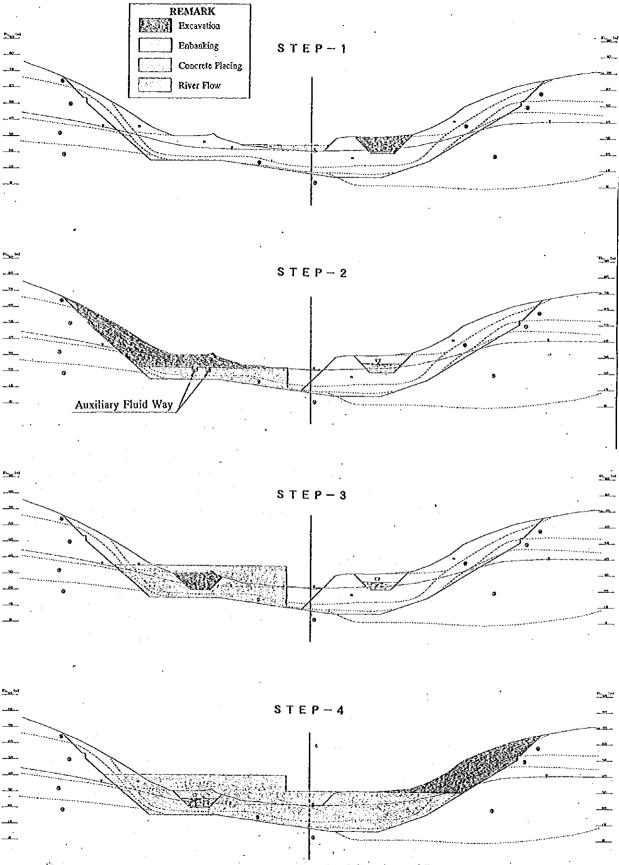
Diversion Works (Longitudinal Section of Dam Axis, Upstream)
